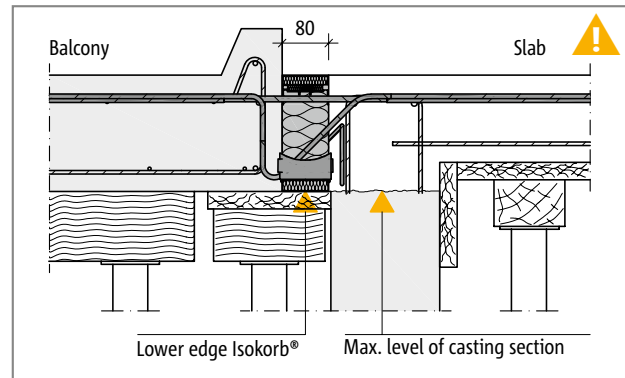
Schöck Isokorb® T type K-E, K-T: Fully-finished balcony with height offset floor on reinforced concrete wall
